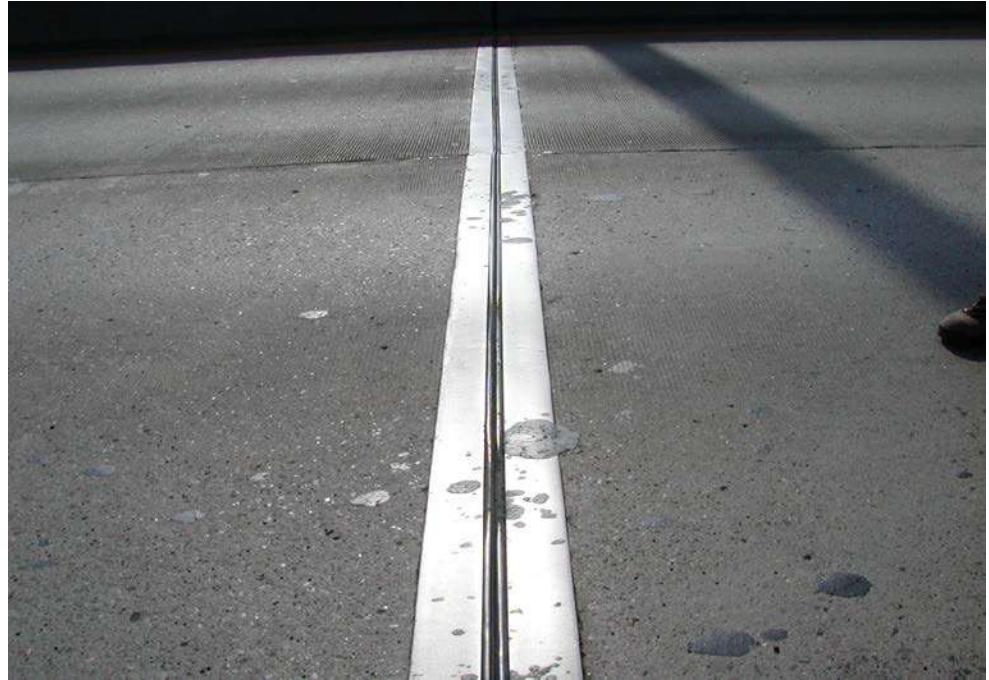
Compression Joint Seal with Steel Angle Armoring
